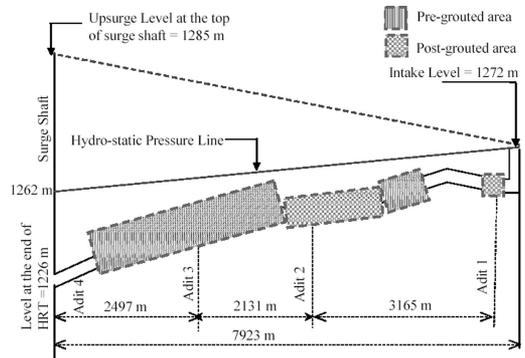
Headrace tunnel profile showing hydro-static line and areas with preinjection and postinjection grouting.
